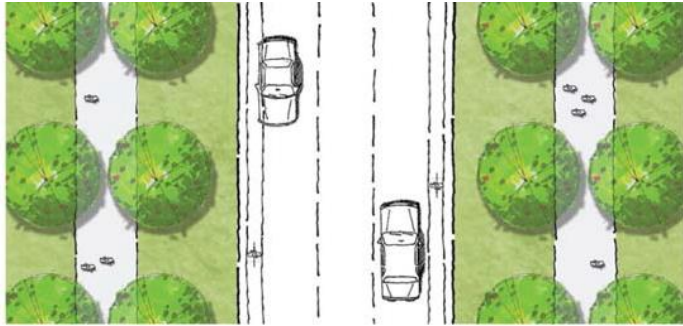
A Plan of typical three-lane Campus Greenbelt
